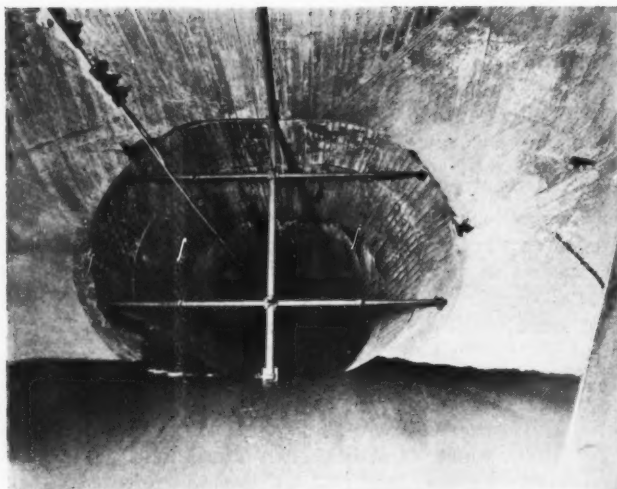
POP VALVES IN CONCRETE PENSTOCK
